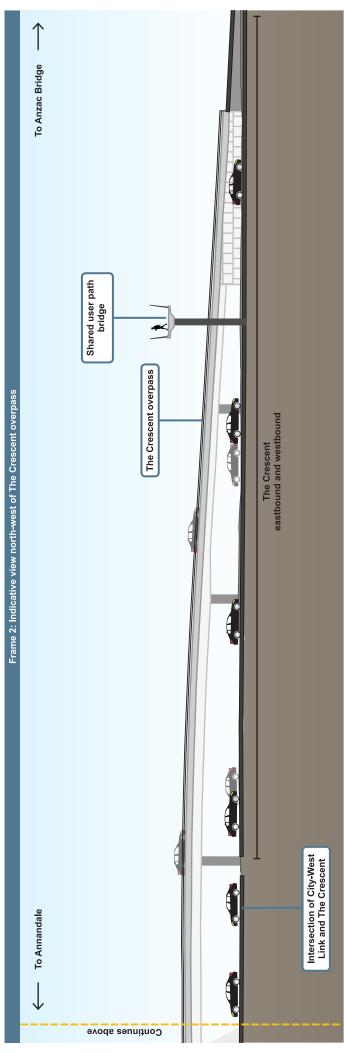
Elevation: Indicative view of The Crescent overpass
